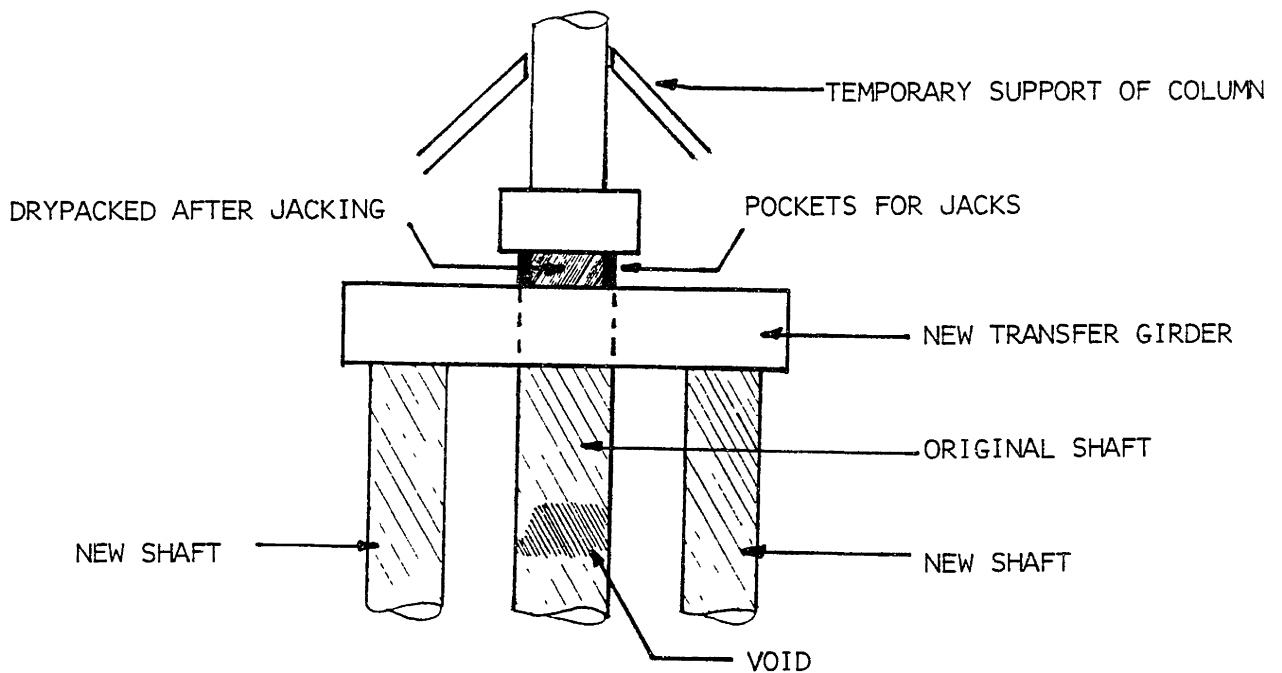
USE OF NEW SHAFTS AND TRANSFER GIRDERS TO REPLACE A DEFECTIVE SHAFT (ADAPTED FROM BAKER AND KHAN 1971)
